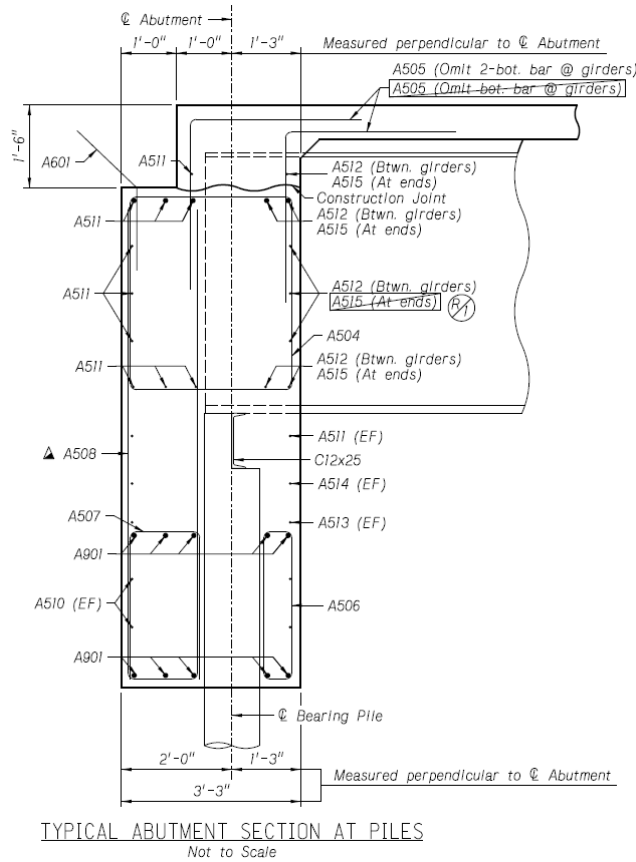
Cross Section of the Integral Abutment (drawings retrieved from Big Springs West I-80 Loop Bridge)
